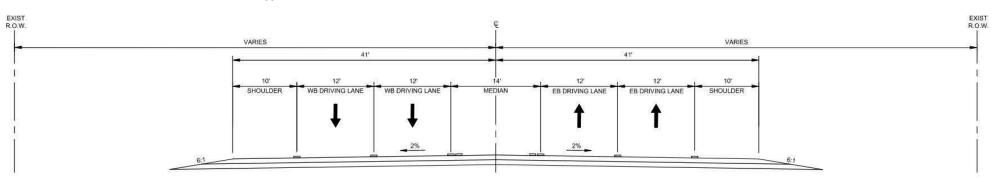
B. NM 31 Alternative 1 and 2 Typical Section MP 3.25 to NM 31/NM 128 Intersection
